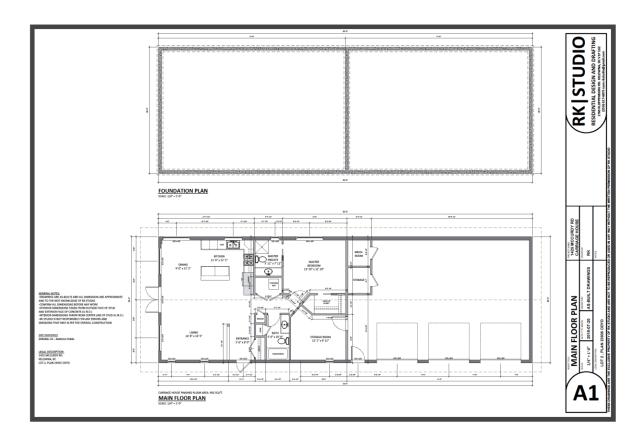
Tentative floor plan of non-farm use building. Access to storage area will be from both the suite and the garage.
